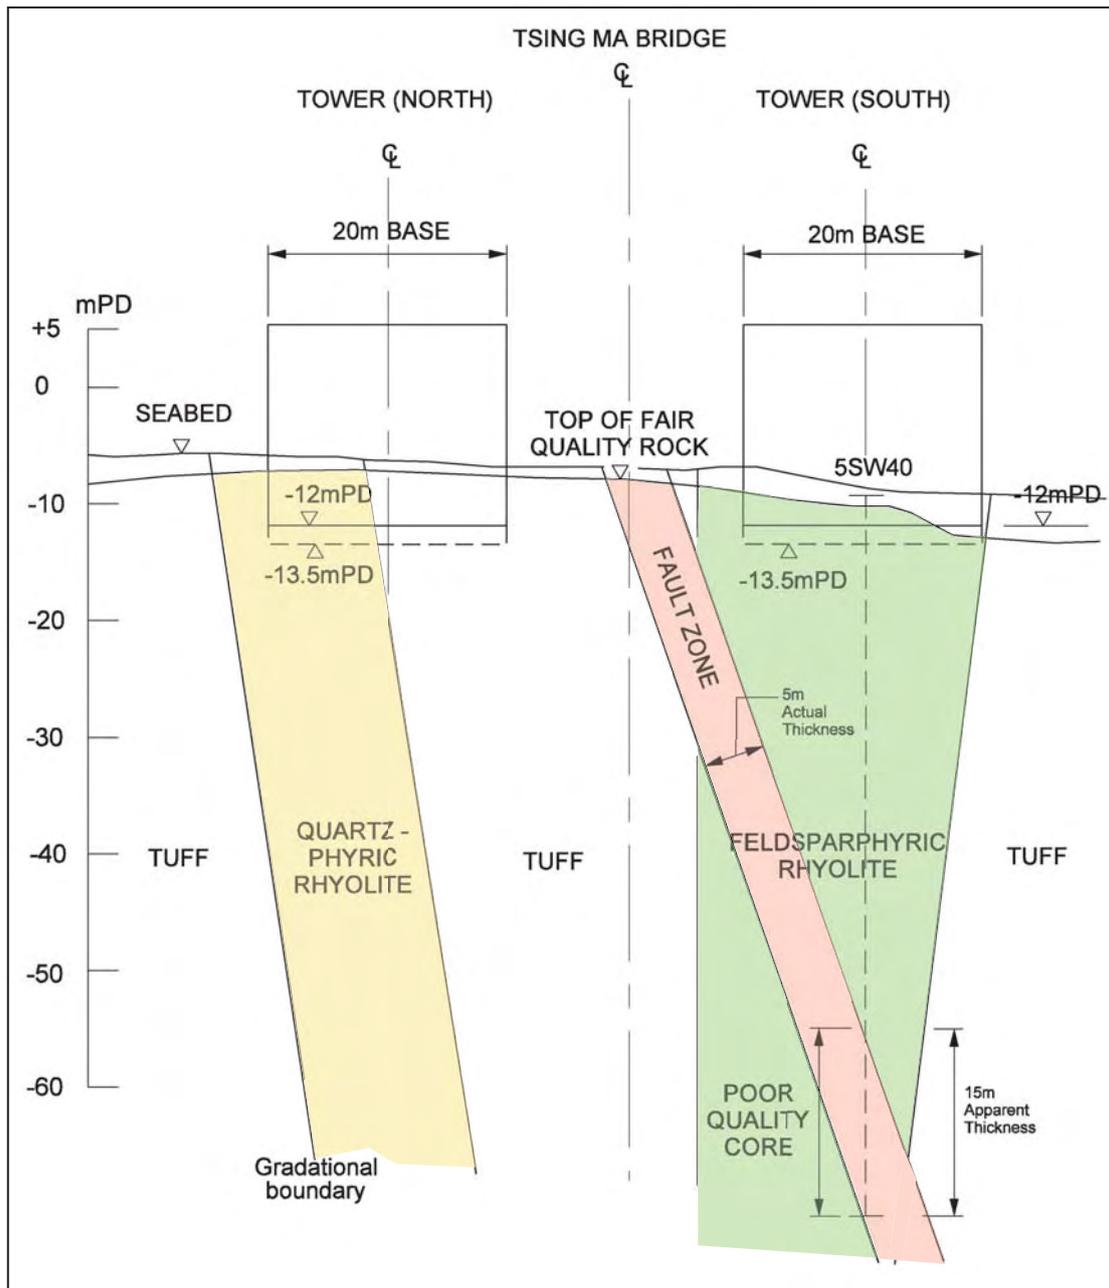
Tsing Ma Bridge – geology of the Ma Wan Tower sites (Sewell, 1992)
